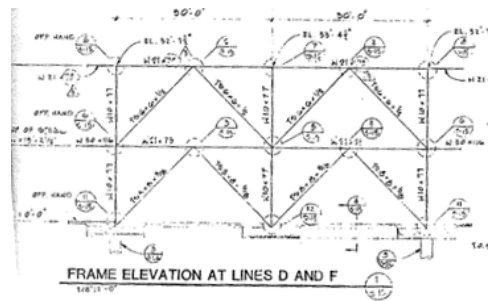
Frame Elevation (83CA2A--D-45-2)
